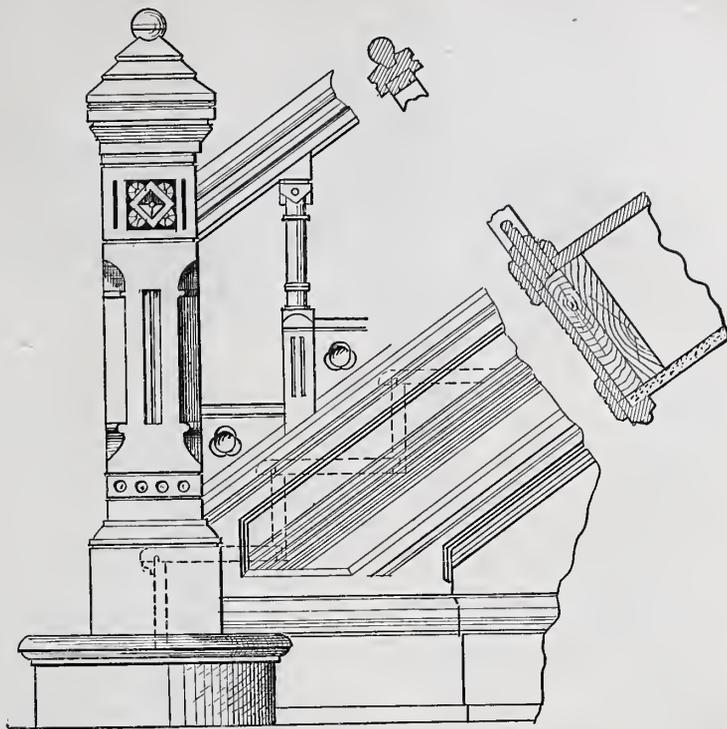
Detail of Main Stairs.—Scale, 3/4 Inch to the Foot.
